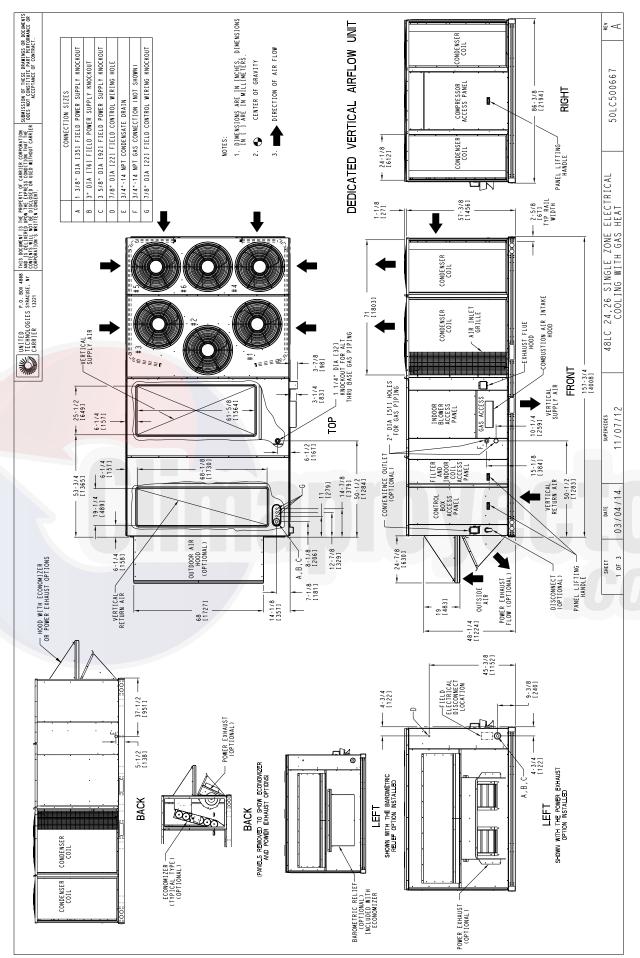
Unit Dimensional Drawing - 24 and 26 Size Units, Sheet 1 of 3
